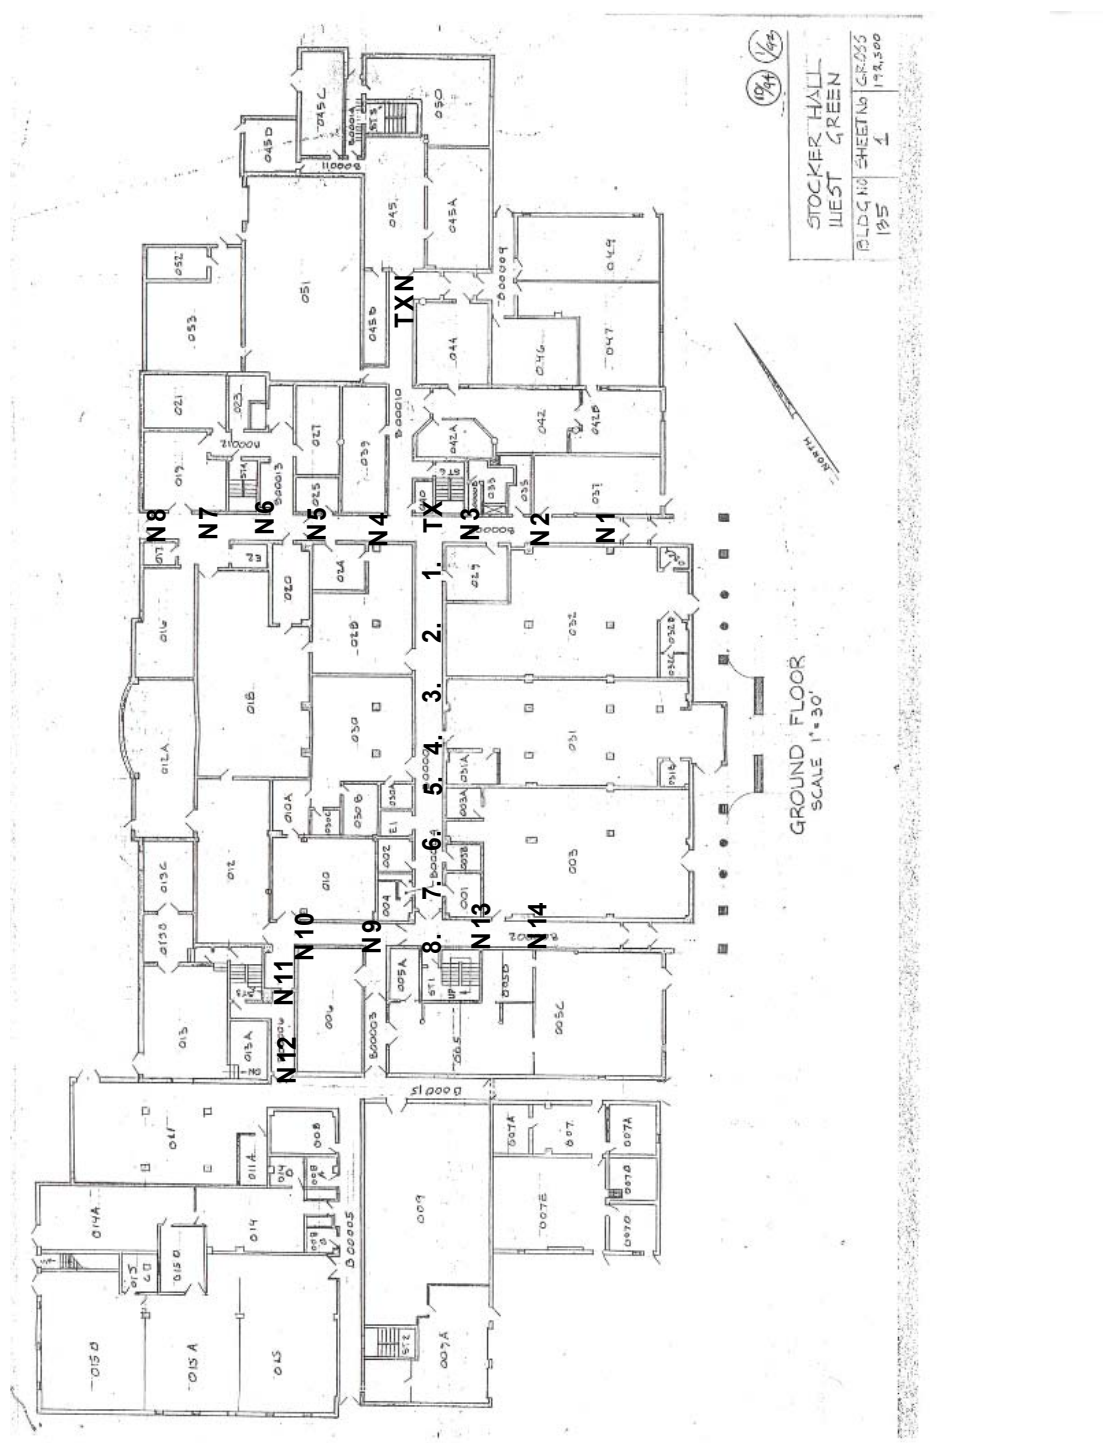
Layout of floor plan of ground floor with transmitter and receiver locations.
